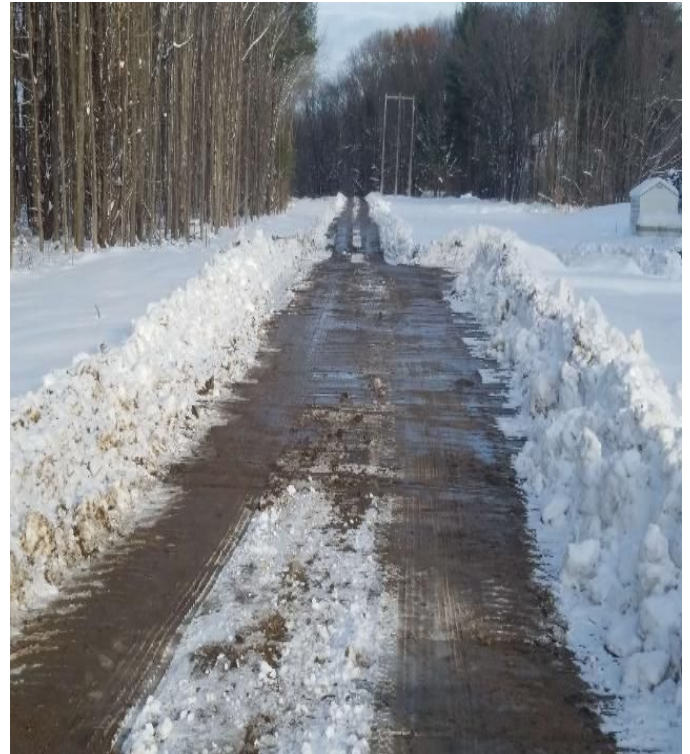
Access road to Str 107. Viewing east. (12-04-19).
